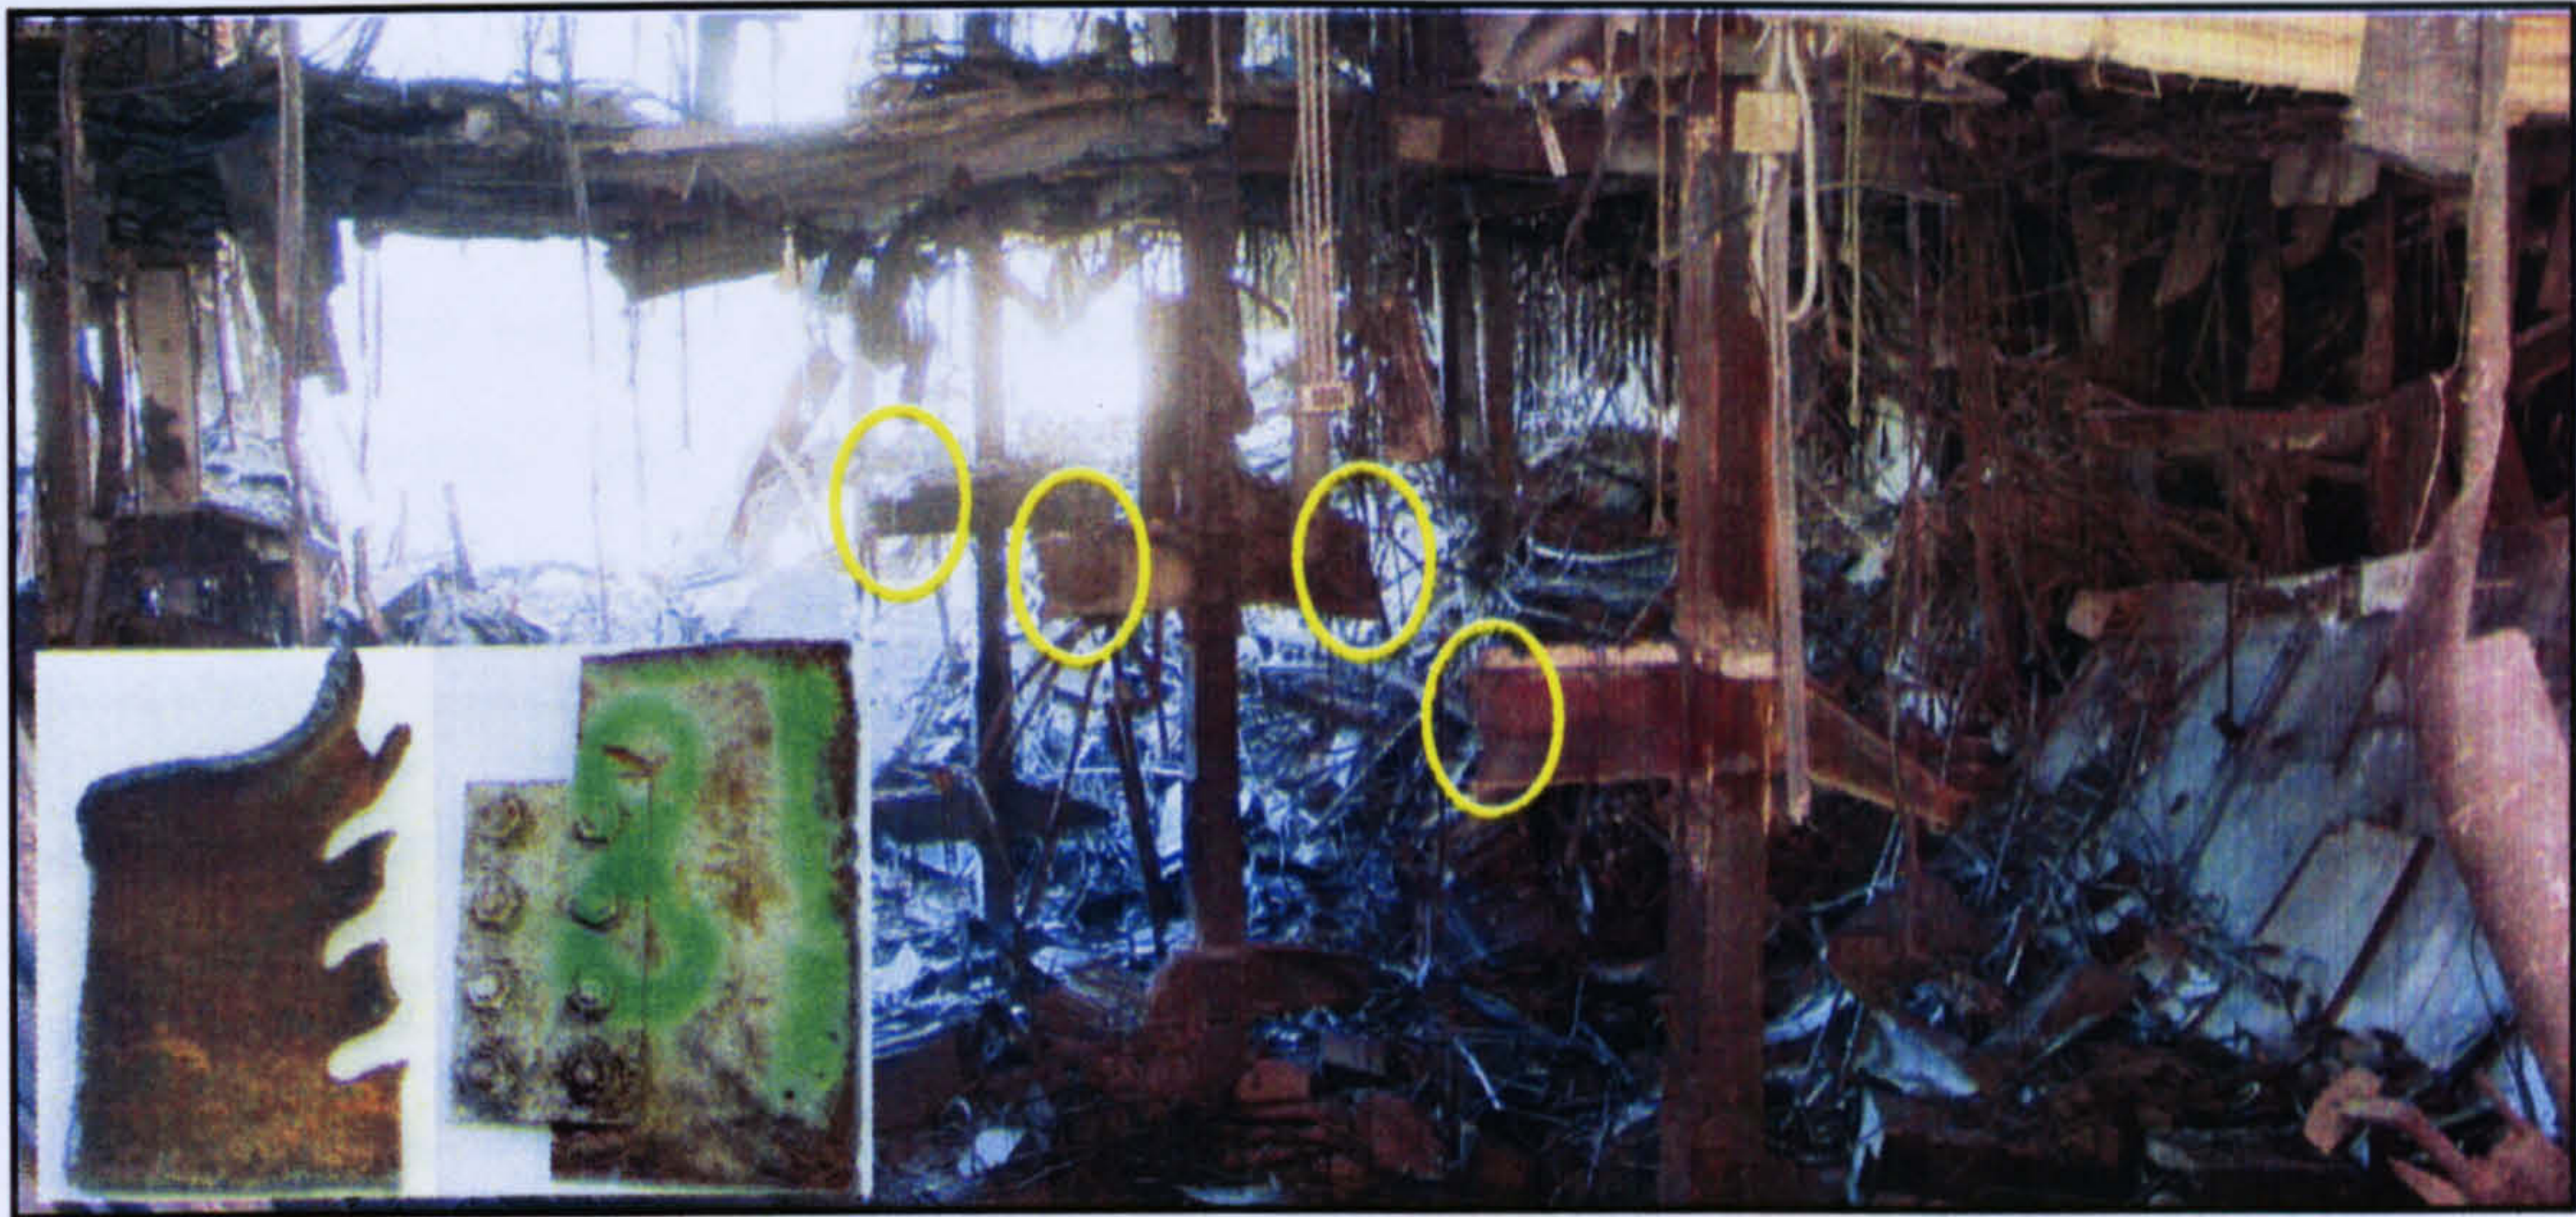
Internal collapsed area in WTC 5 with close up of shear connection failure at tree column ^{1,2}.
